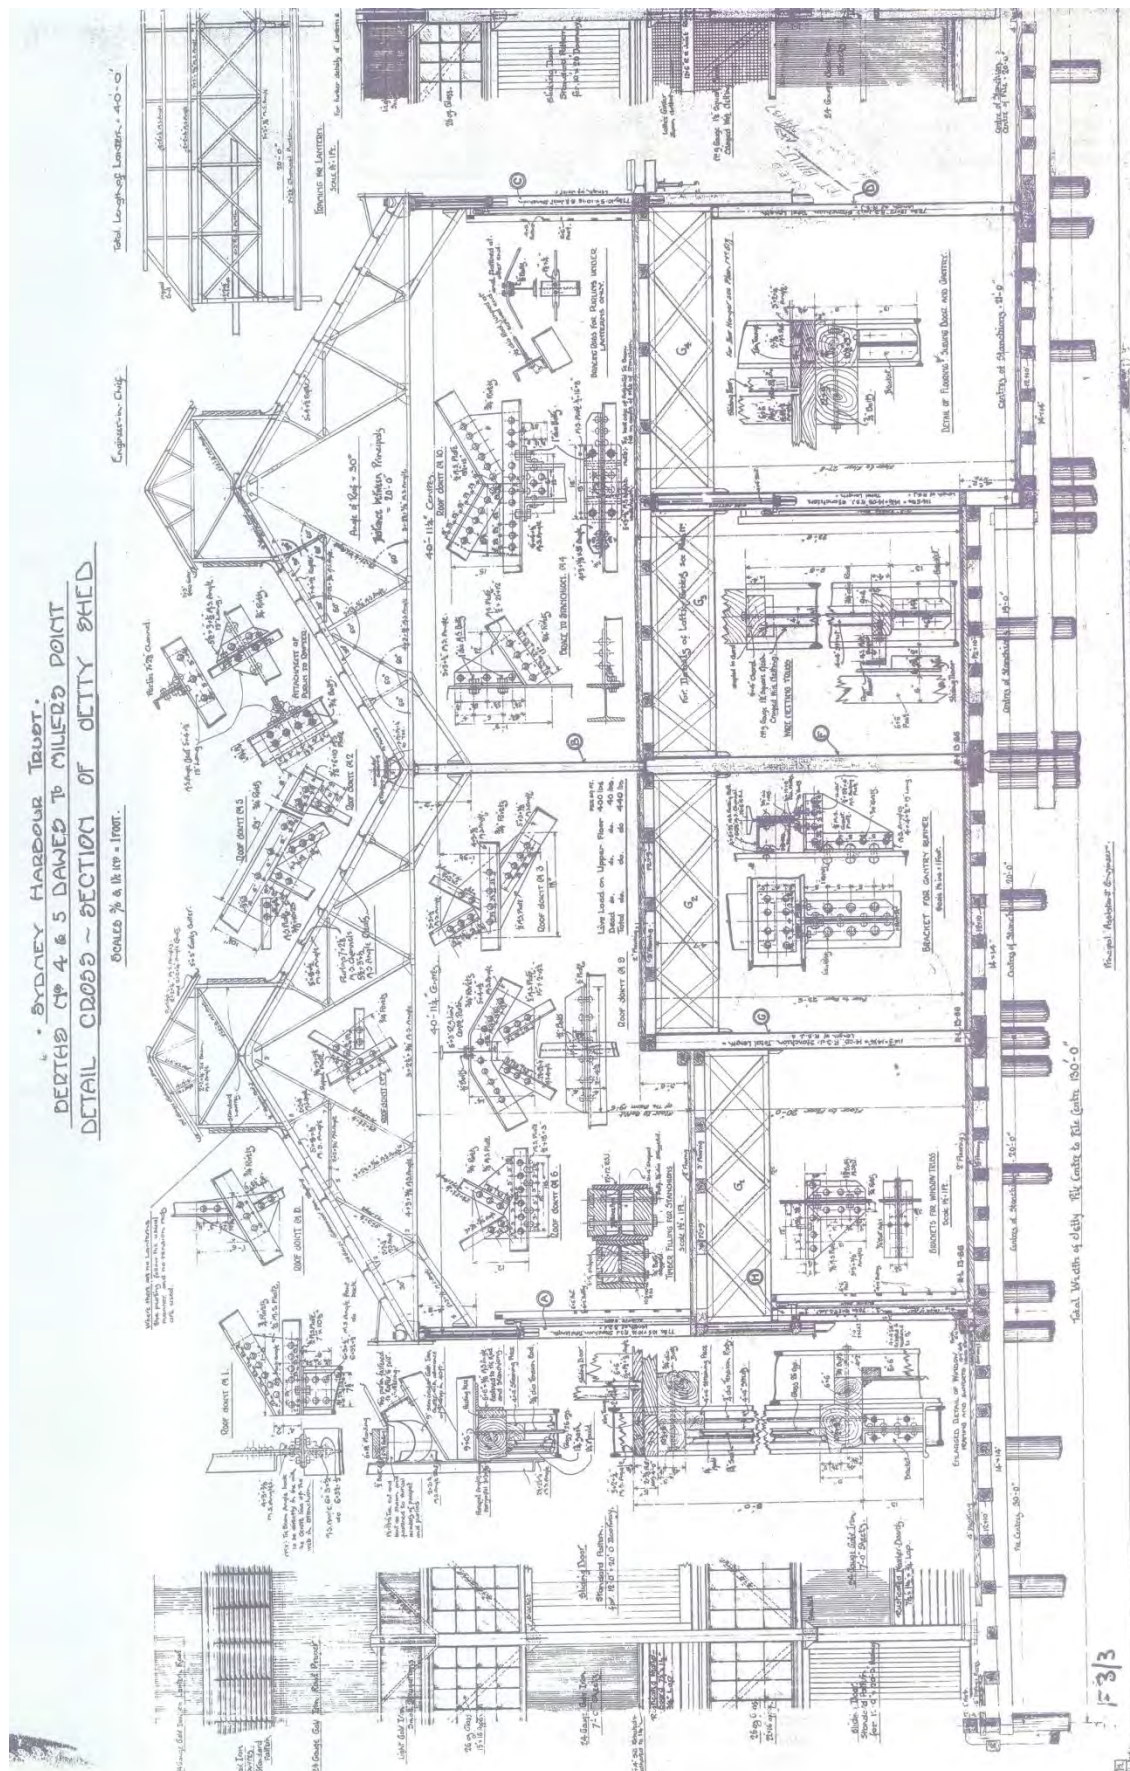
Historical drawing by Sydney Harbour Trust - Cross Section Berths 4/5 Walsh Bay
